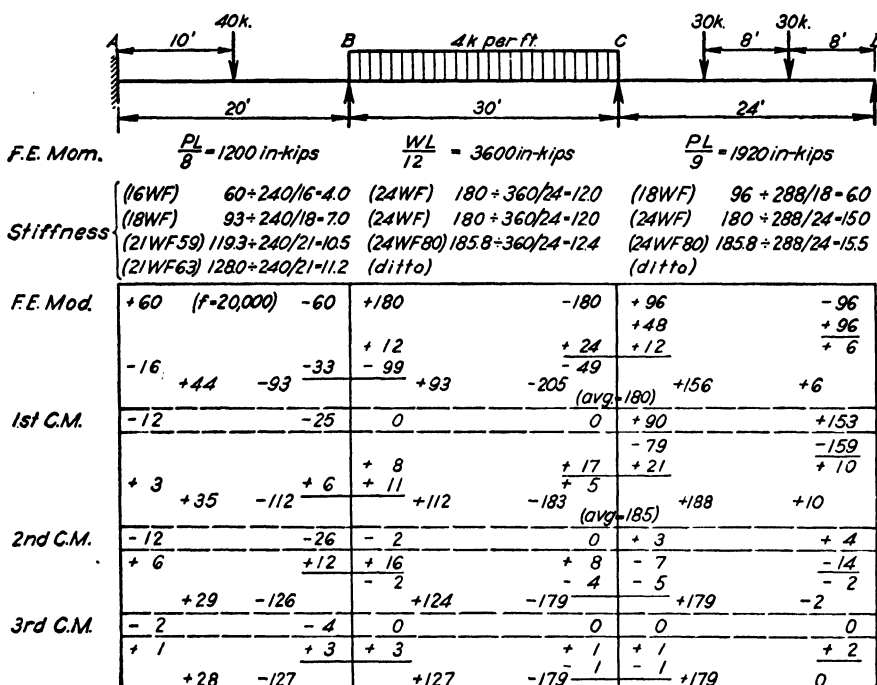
AUTOMATIC DESIGN OF A CONTINUOUS BEAM.
